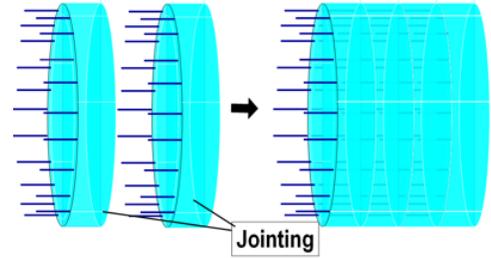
Ring-paneling with PVC panels (Kampbell, 2009)
